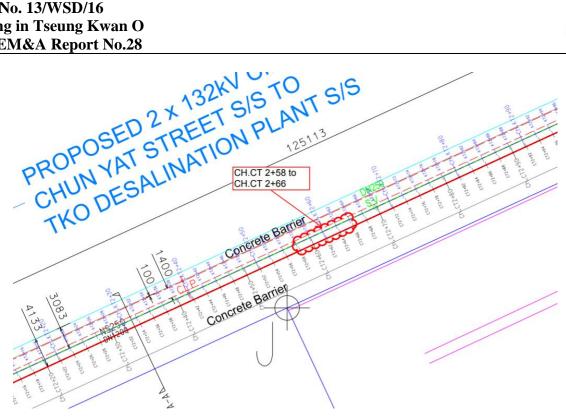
Location Plan for CH.CT 2+58 - 2+66
